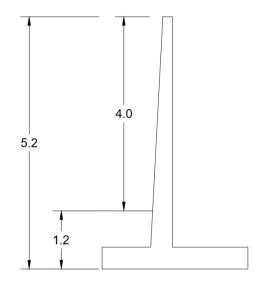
Cantilever retaining wall (Overall depth of wall)
